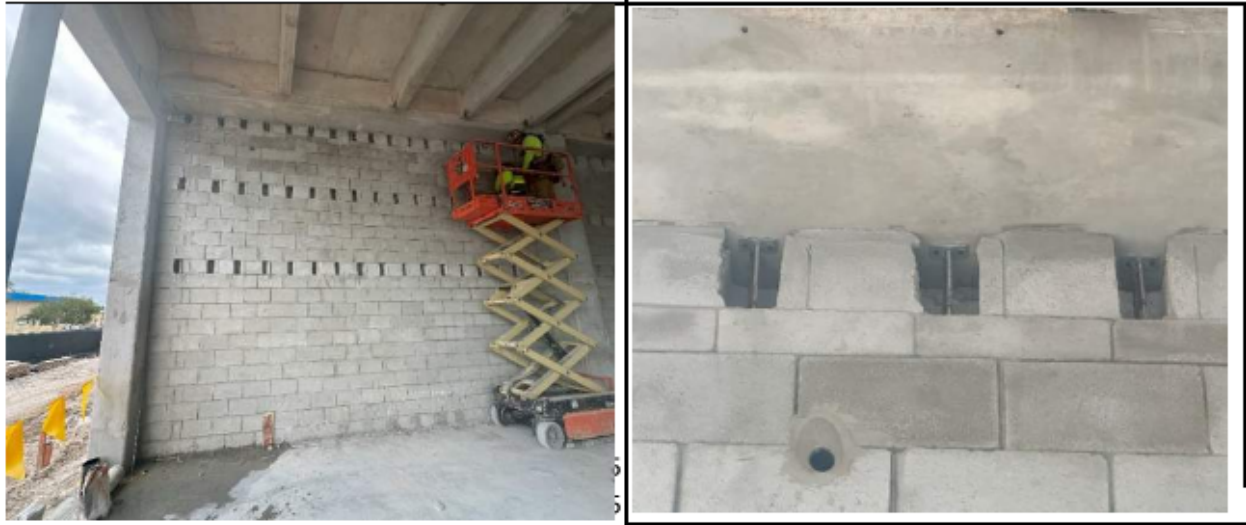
Photographs from Threshold Inspection Report No. 081. Left photograph shows overall wall construction on first story at one location. Right photograph shows the PTA anchors at the top of the wall. Note that two screws are used to connect each anchor to the above element
